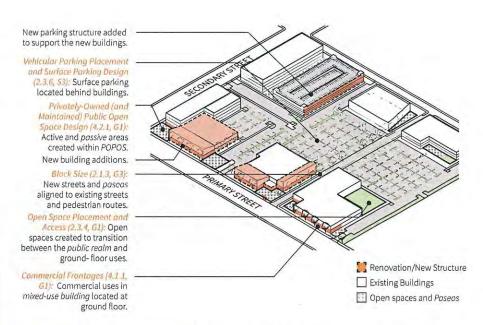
Renovated office development - New buildings and renovations designed to provide active primary street frontage, publicly-accessible open space, and clear, safe pedestrian paths. A new garage designed to meet the requirements of the new office buildings and screened from the public realm using façade treatments.
